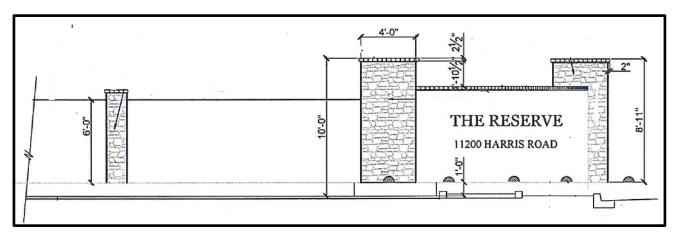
Wall/Pilaster Elevation (Harris Road Entrance)
